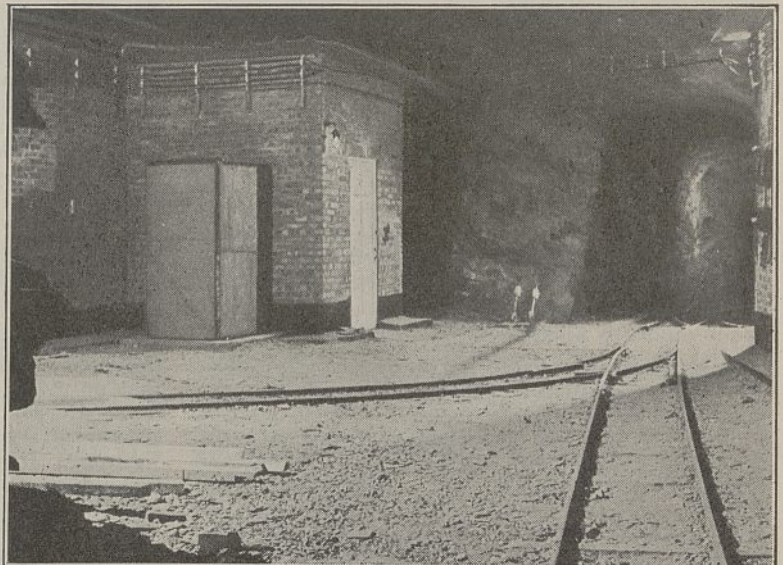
A TYPICAL PLANT ROOM AND PART OF STORAGE BUILDING.
